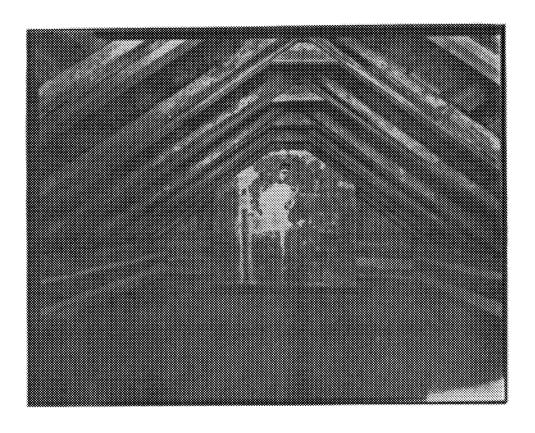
Hampton Quarter 1, attic: view of northwest fireplace wall in southeast room looking northwest.
